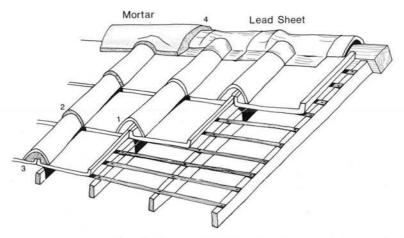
Schematic reconstruction of roof of Roman buildings based on surviving tiles and shaped mortar
